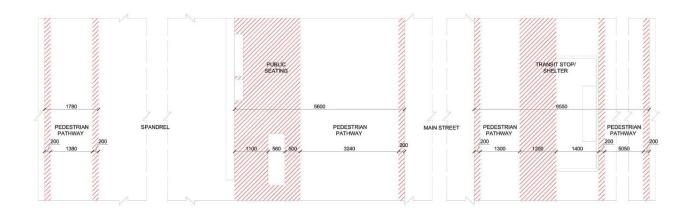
Street width and buffer spaces (in mm) for Gateway 4 in the area surrounding Marktplatz in Offenbach am Main
